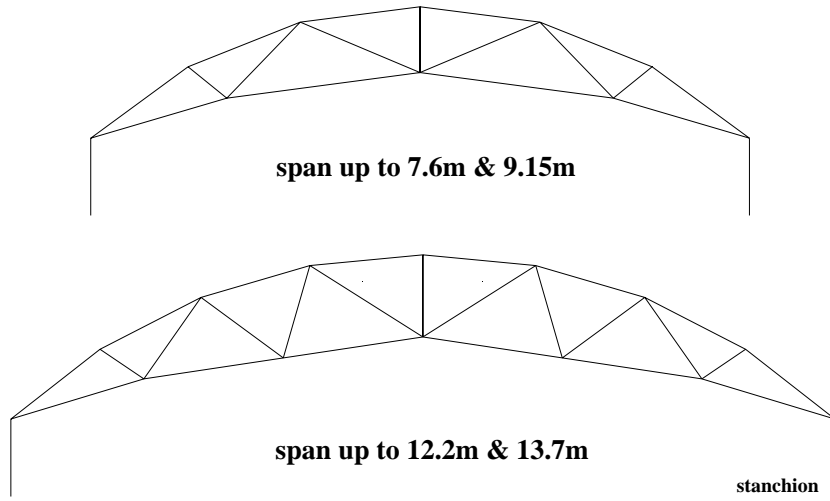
Triangulation detail for gathered (haybarn) roof truss
